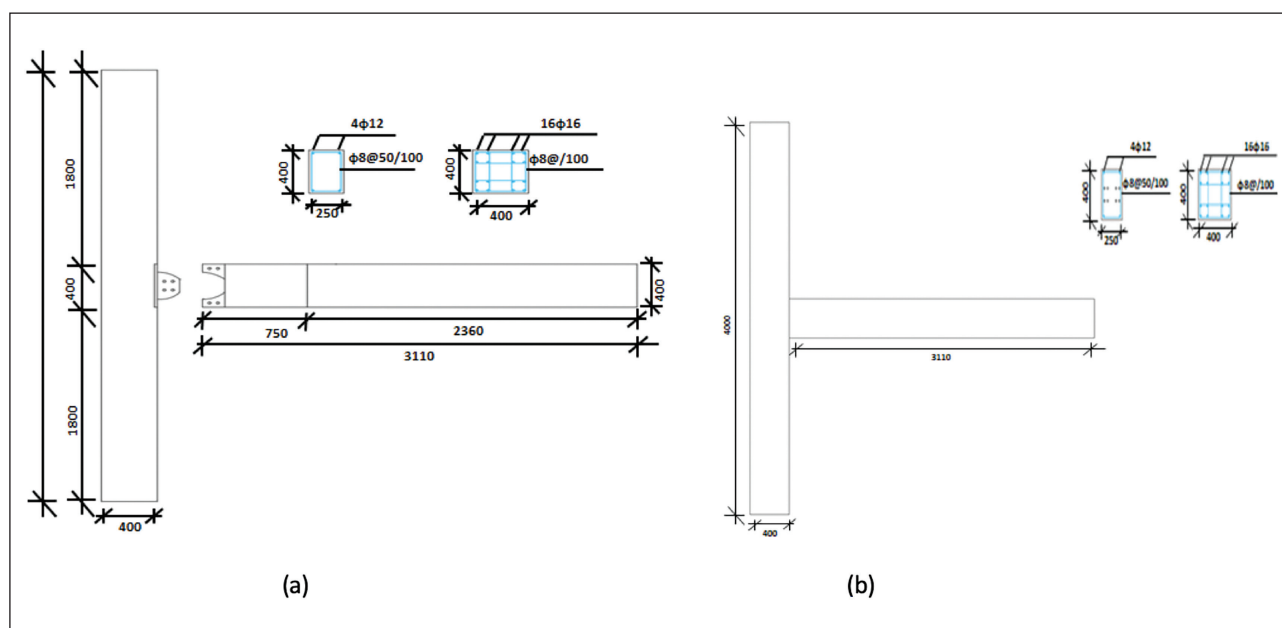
(a) The cross-section area of the precast concrete beam to column, and (b) the RC frame.
